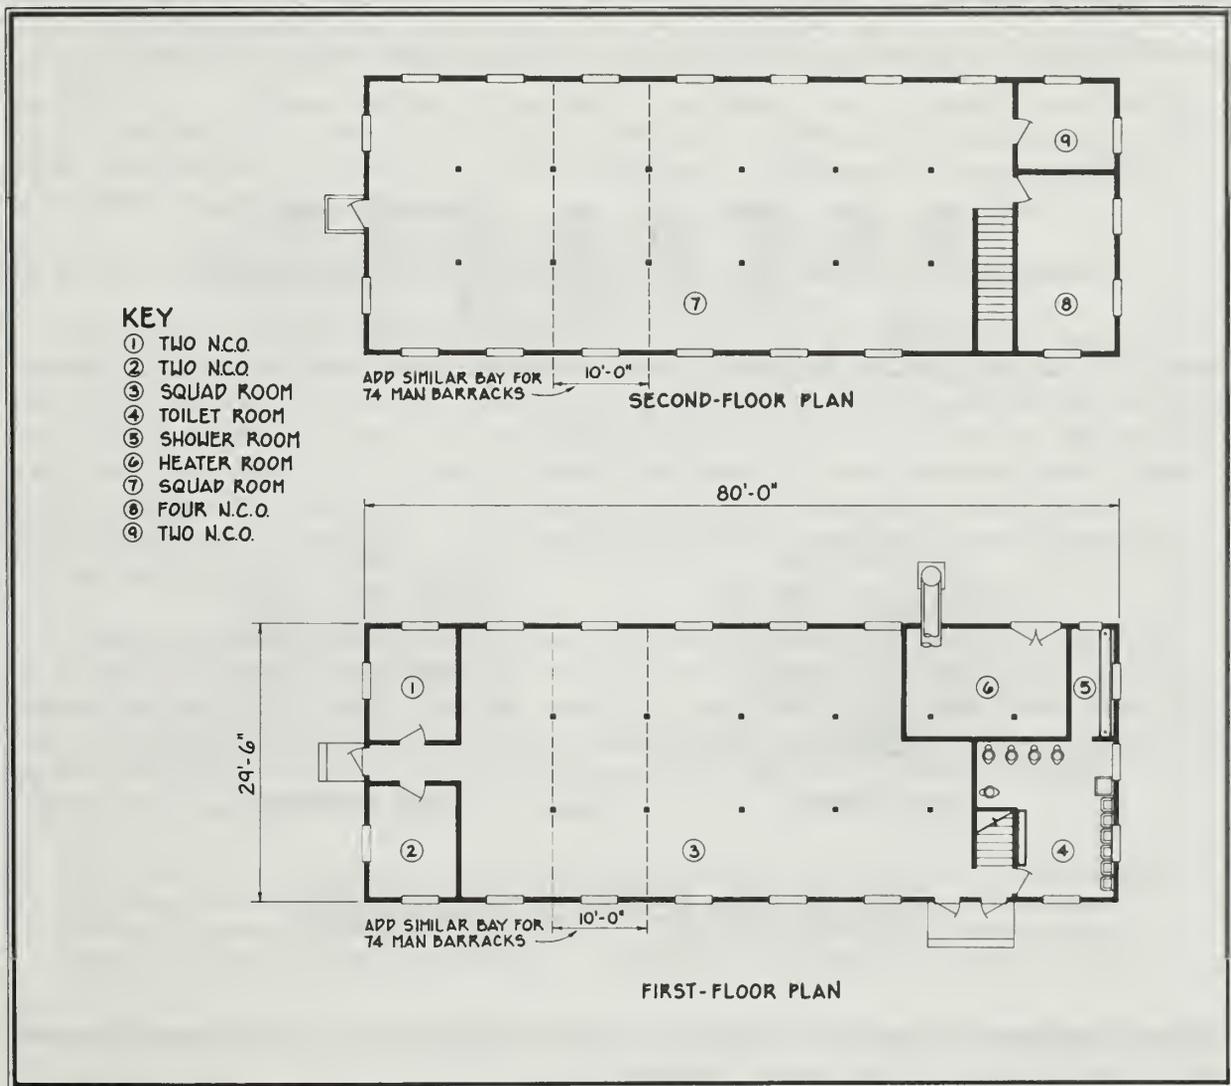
Floor plans of 45 & 63 Men Barracks - 700 Series.
